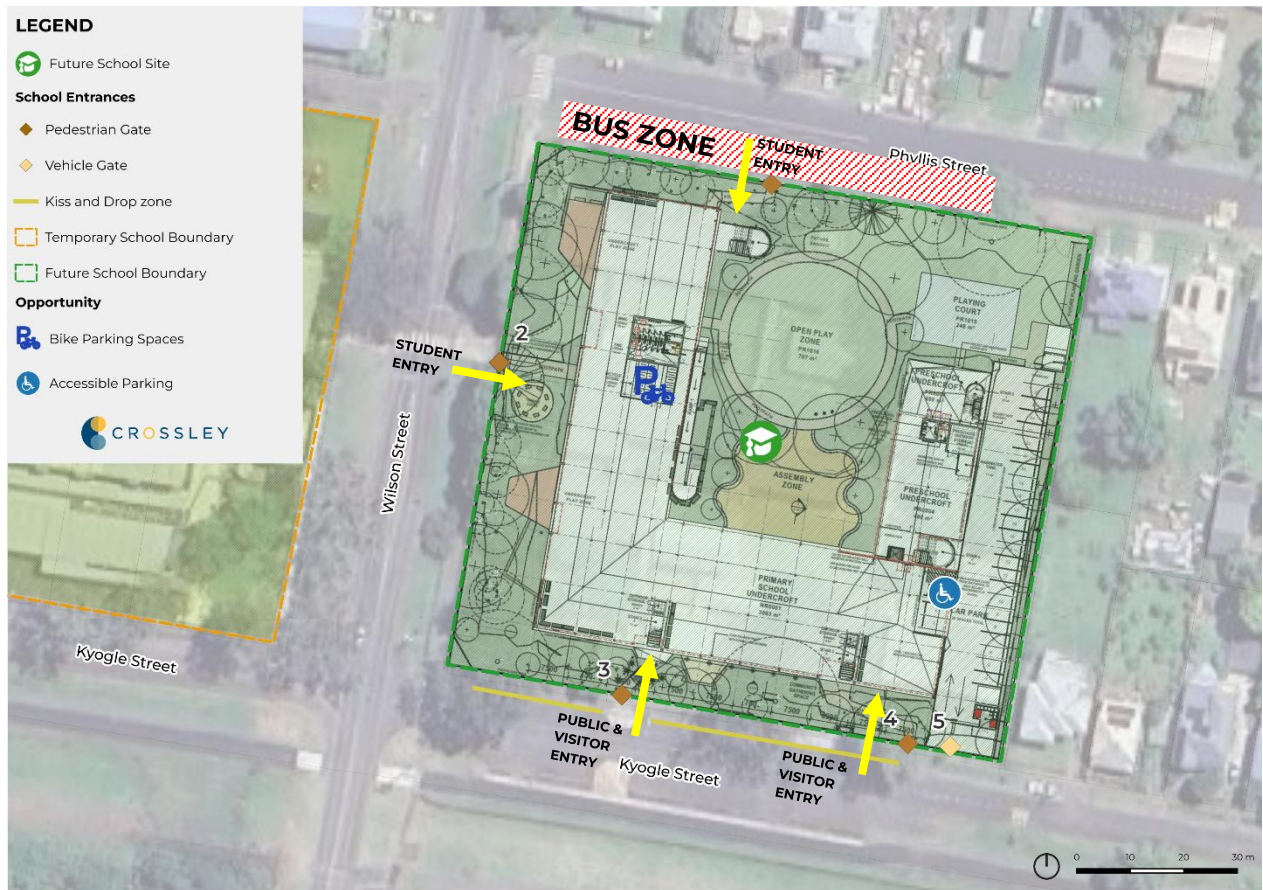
Proposed site entry points (Source: CrossleyTP, 2025)
